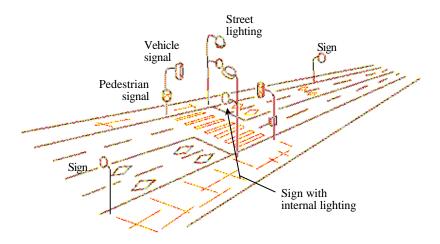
Typical Facilities of Crosswalks at Road Sections
